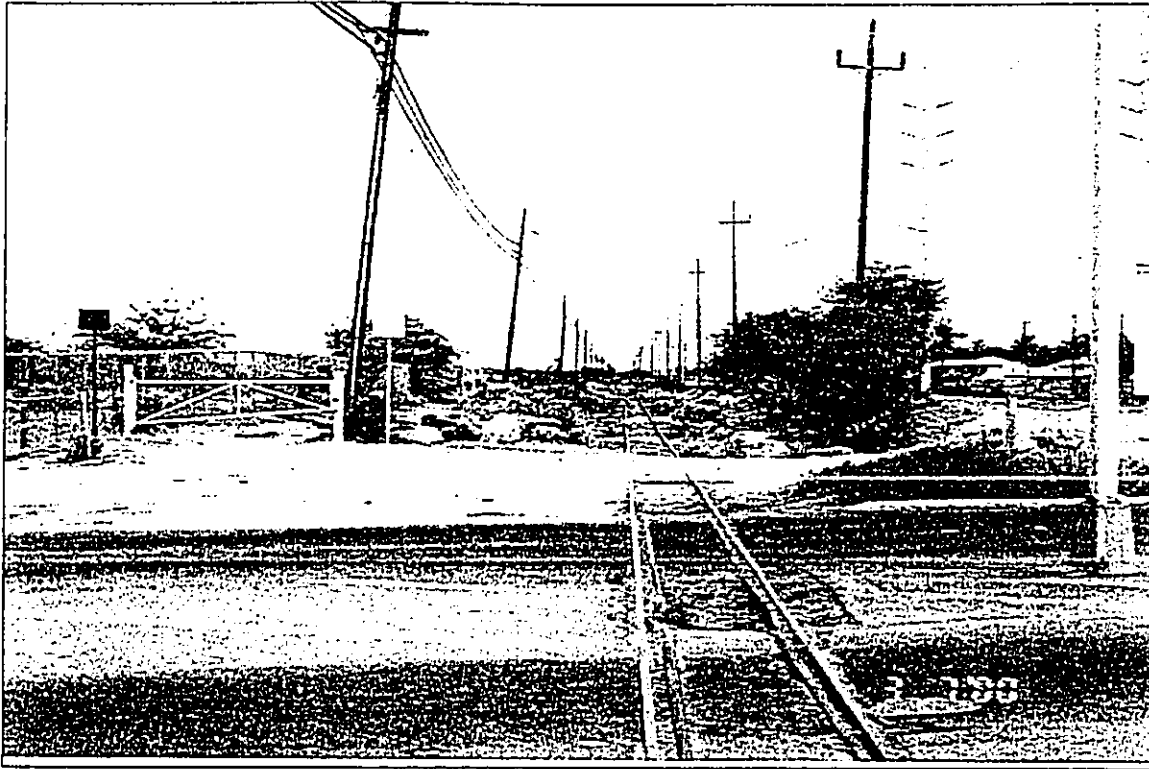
View east of the proposed project area at the Fort Barrett Road crossing. Note the warning signs for the petroleum pipelines (energy corridor) to the right (south) of the tracks, and the fenced construction area north of the tracks.
